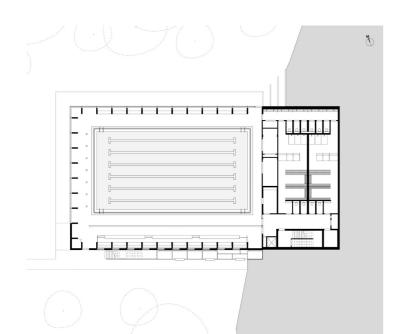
Lower Ground Floor Plan by Hawkins\Brown. (ArchDaily, n.d.) Used with permission.
